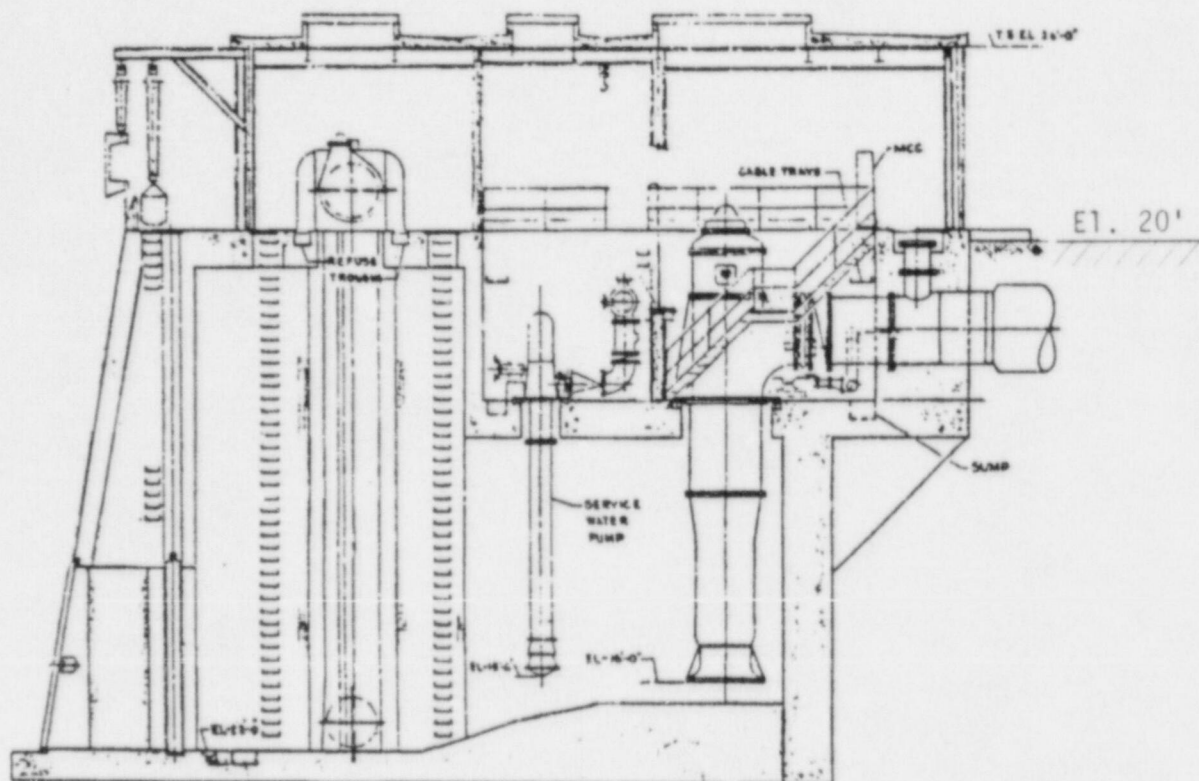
Elevation of the Intake Structure Showing Critical Equipment Locations.
